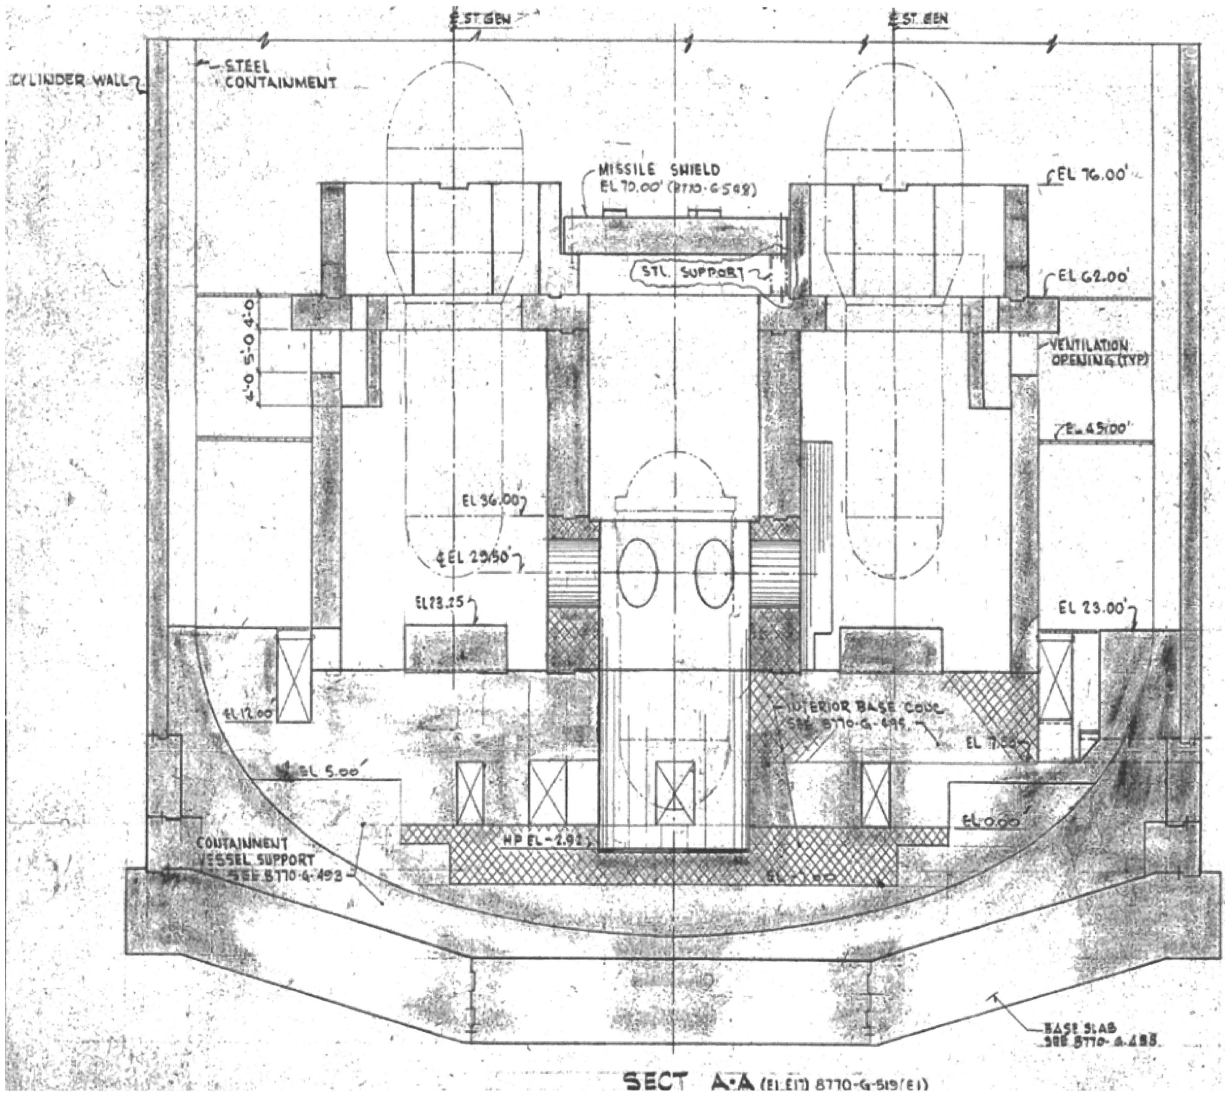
Elevation View of the PSL Containment Concrete
